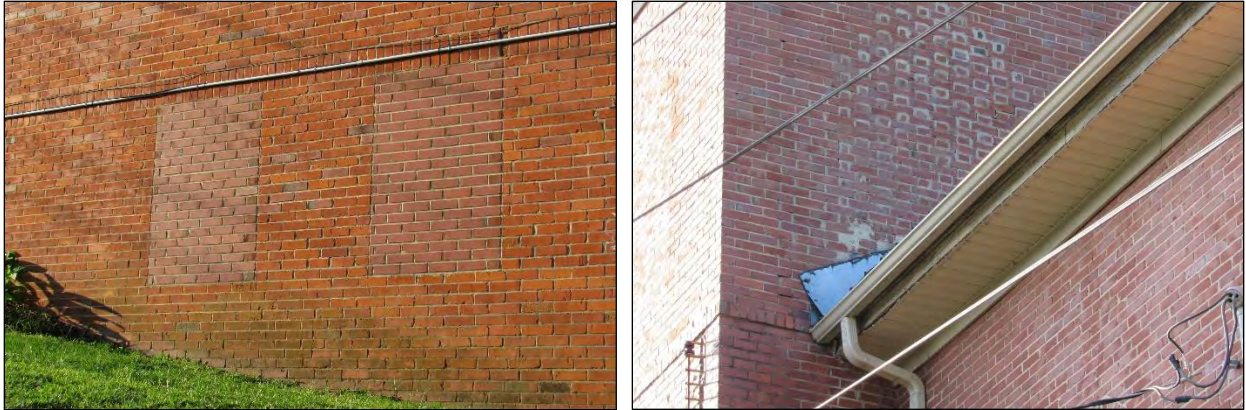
Detail of Bricked-in Areas on North Elevation (Left) and Bricked-in Area on Towers, Looking East, Right.
